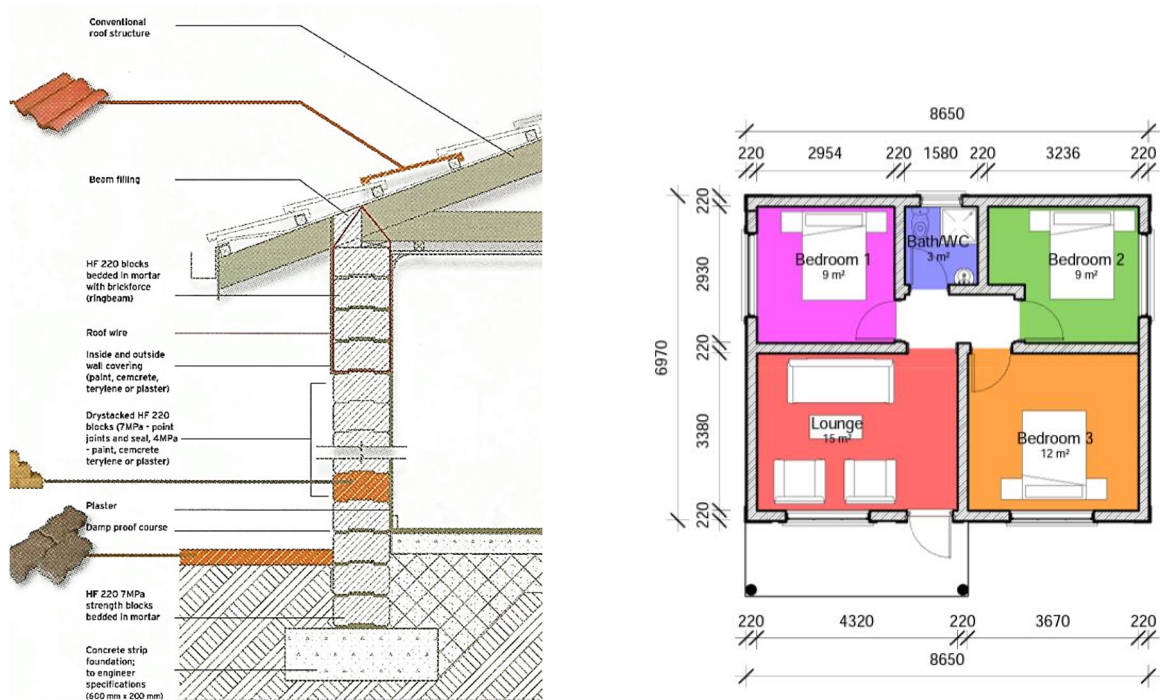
Wall section and layout of the housing prototype used for mathematical simulations (Source: Hydraform)
